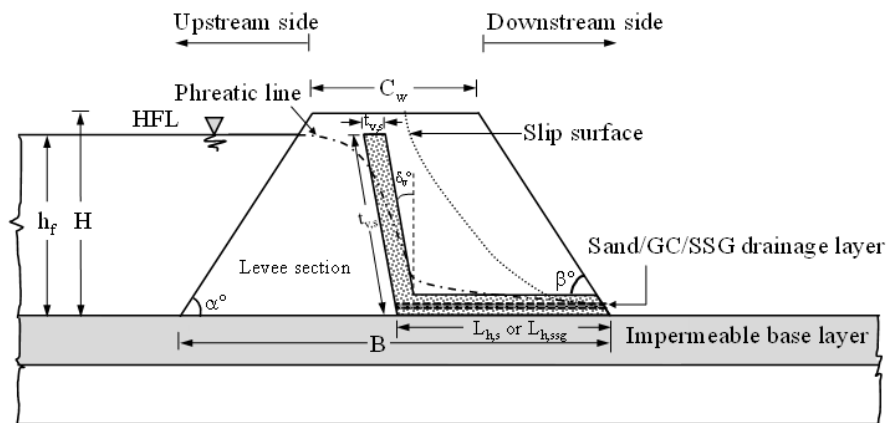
Schematic cross-section of levee section with chimney drain subjected to flooding
